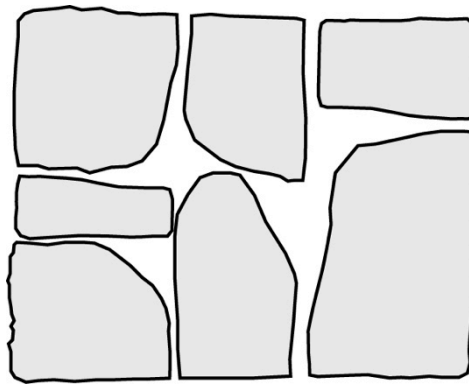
12- Horizontal plan of masonry section illustrating exterior regular joints with irregular interior shape
